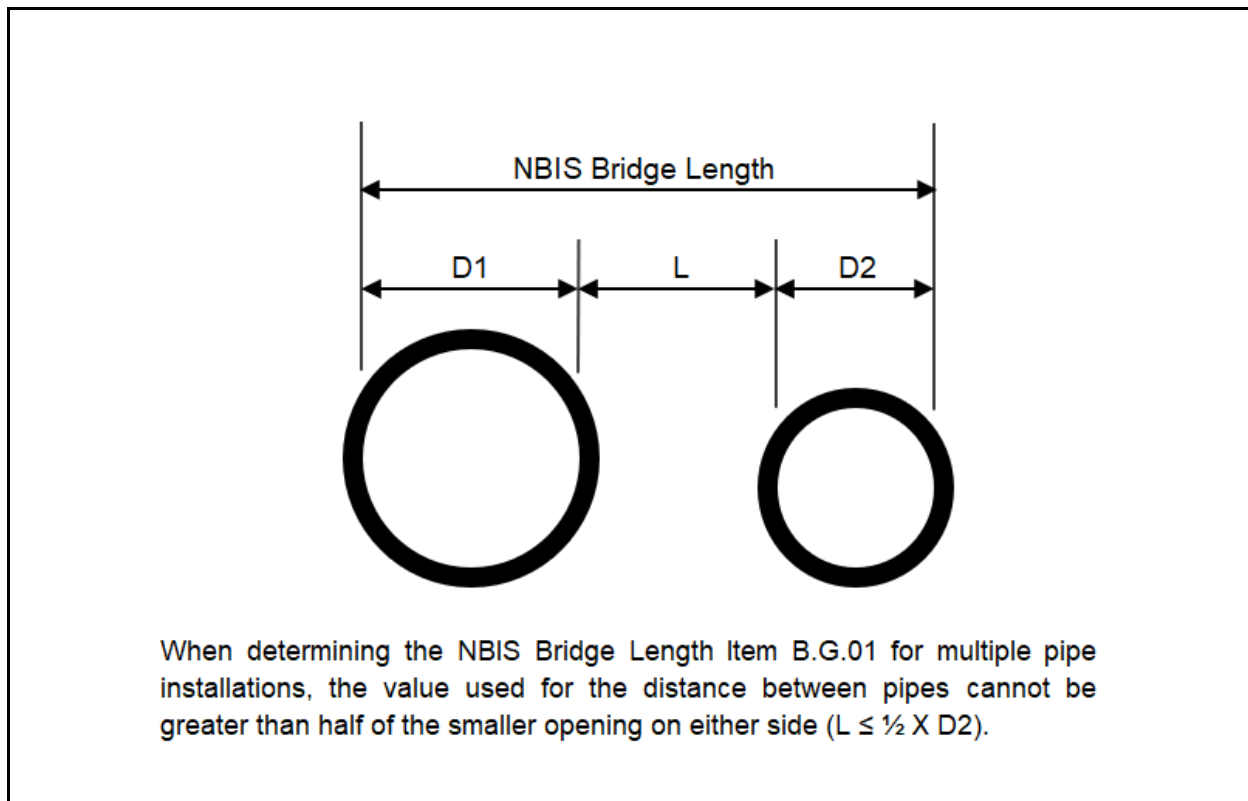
NBIS Bridge Length Item B.G.01 for Multi-Pipe Culverts
